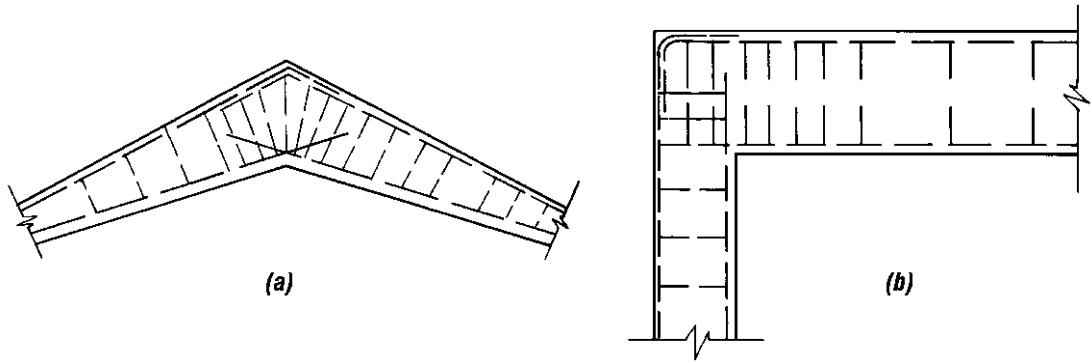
Reinforcing arrangements at right-frame joints.
